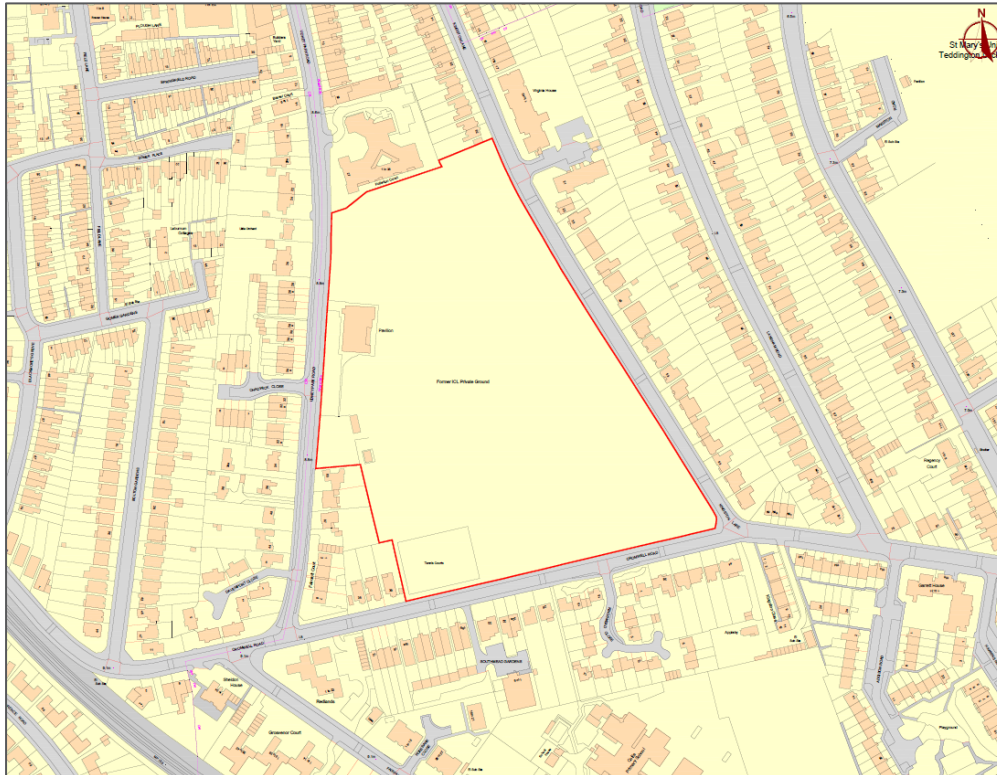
The Development Site (Quantum Group Location Plan – Ref.900-SK01)
